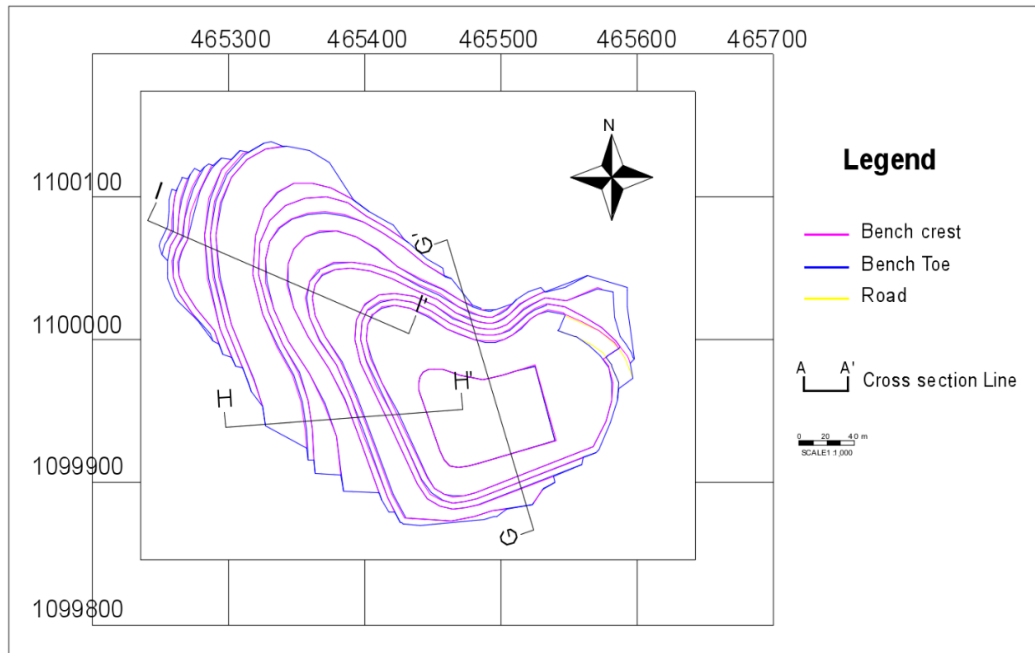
34 Pit MF-10 after mining by Pit design Ver.3 and its cross-section line
